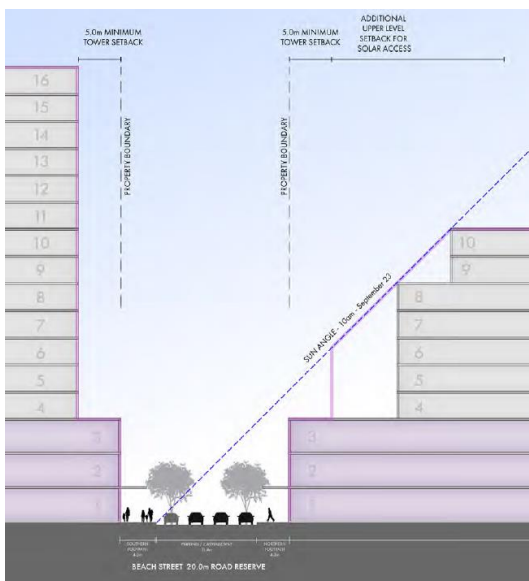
Beach Street Cross Section - Proposed building heights and sun angle
